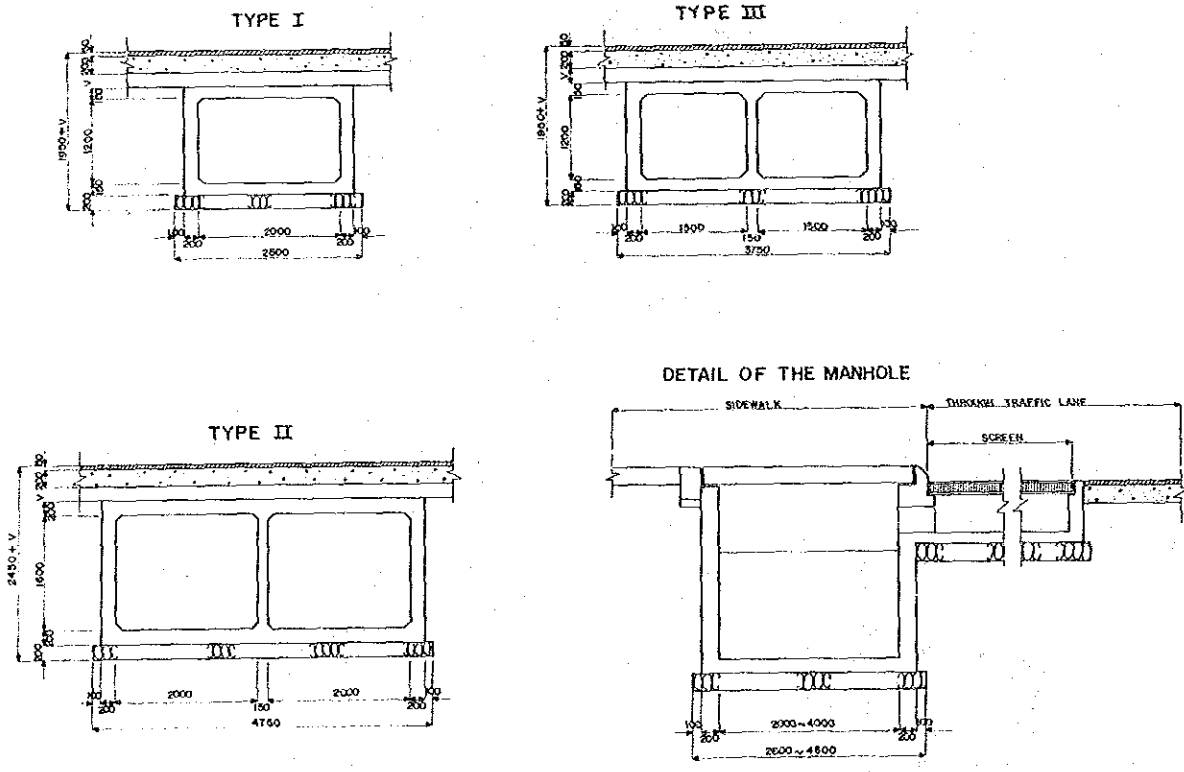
Detail of the Culvert Box and Manhole
